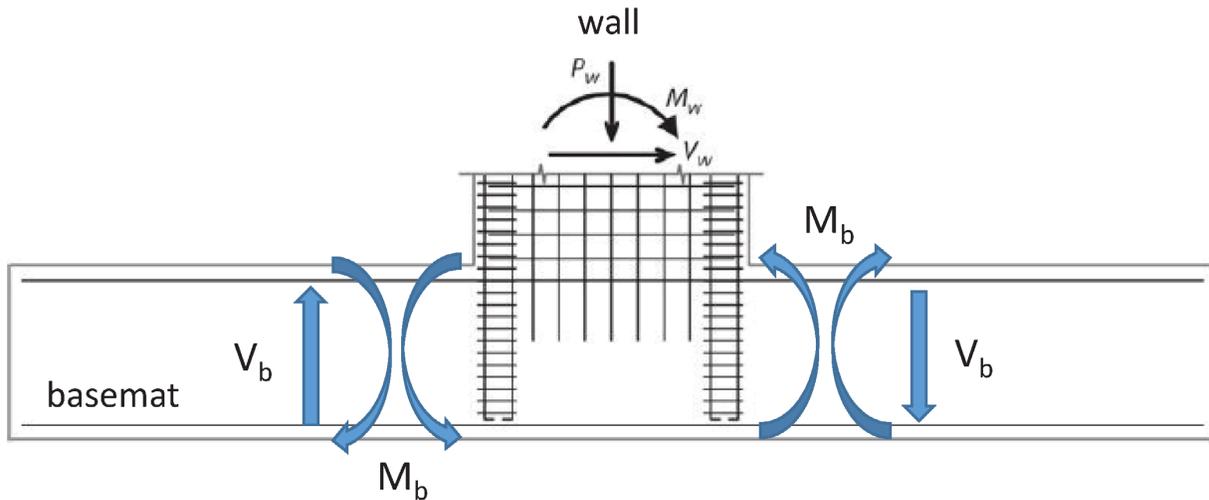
Section cuts for one-way and two-way shear in basemat subject to wall overturning
